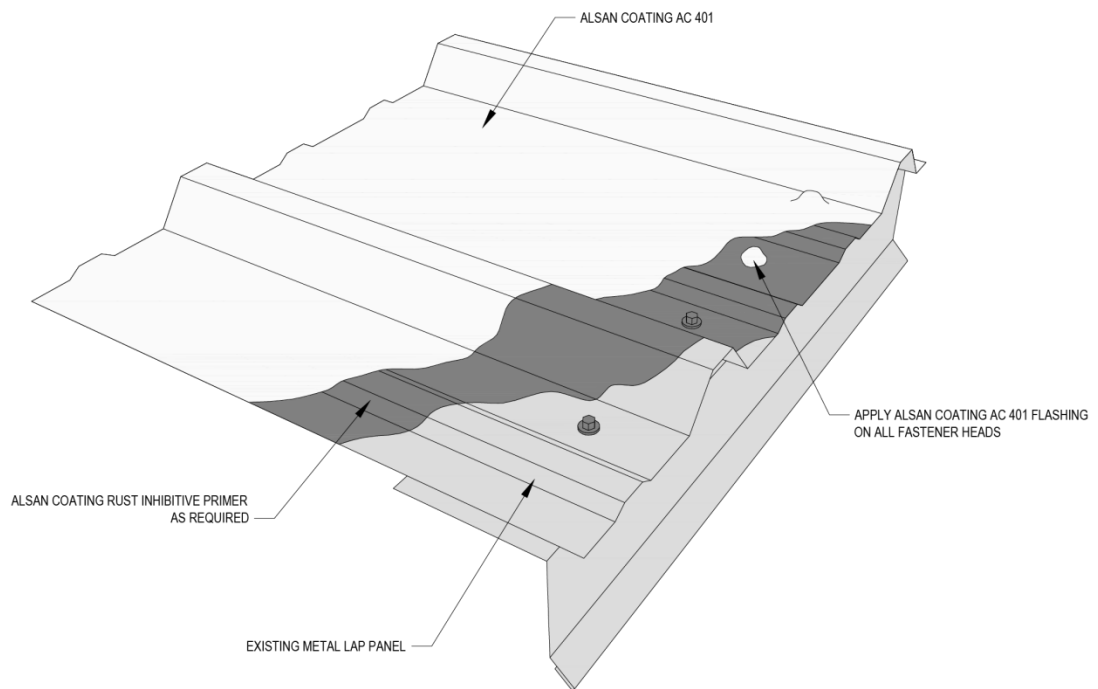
Acrylic Roof Coating Over Metal Lap Panels, Edge
